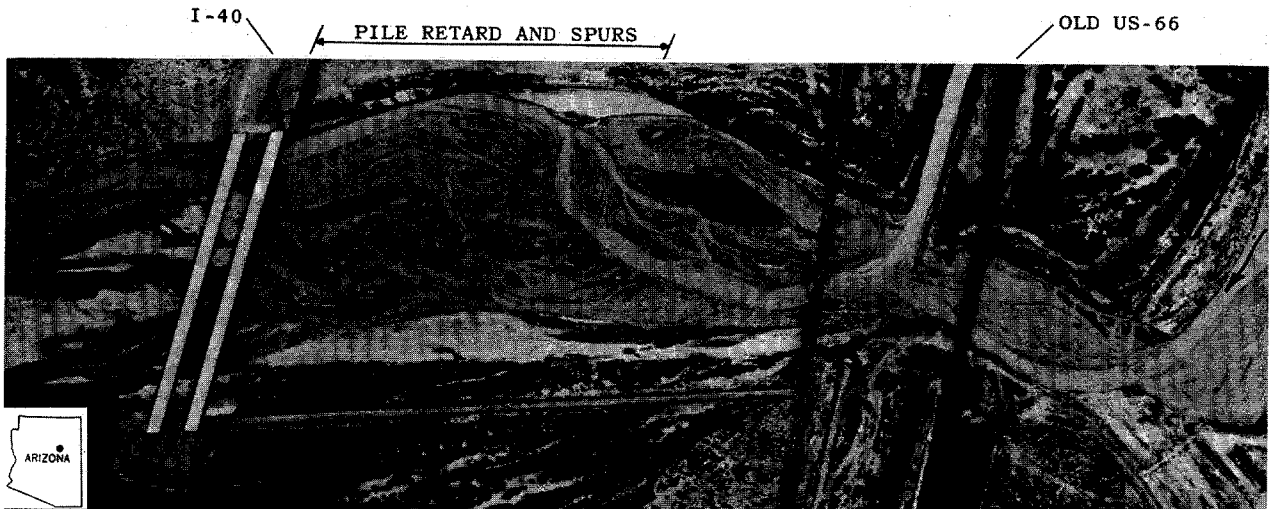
Aerial view in 1975 showing channel alignment and retard built to prevent lateral erosion of right bank. (From Arizona Dept. of Highways.)
